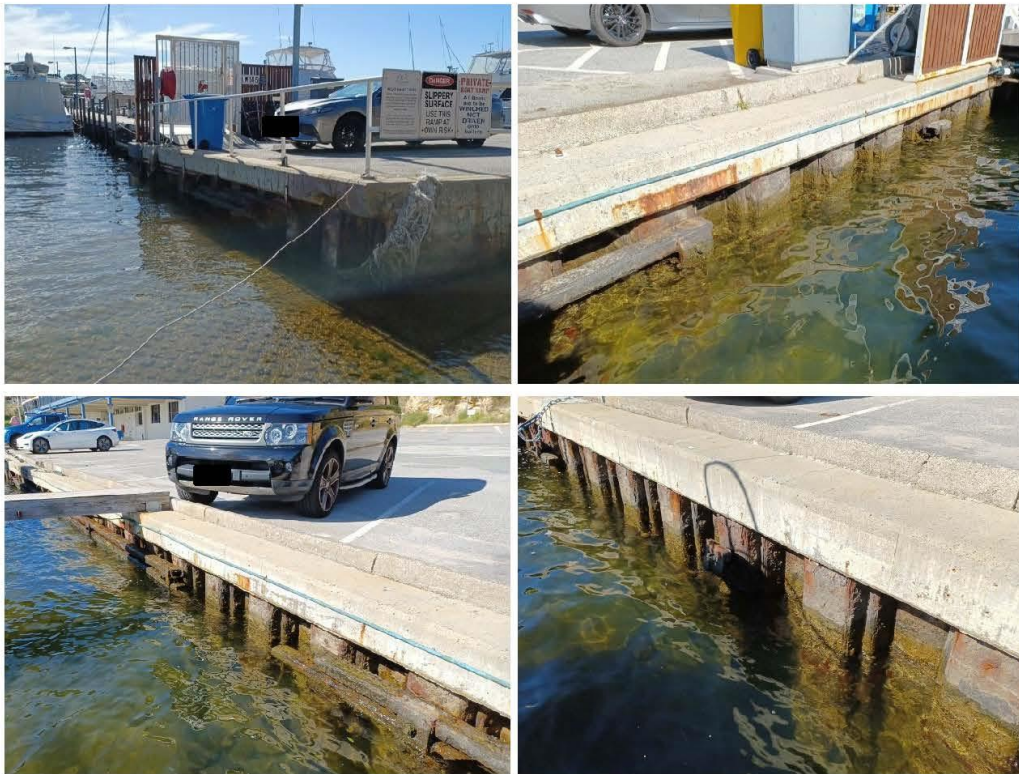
Sheet Pile Wall with Concrete Pile Cap
